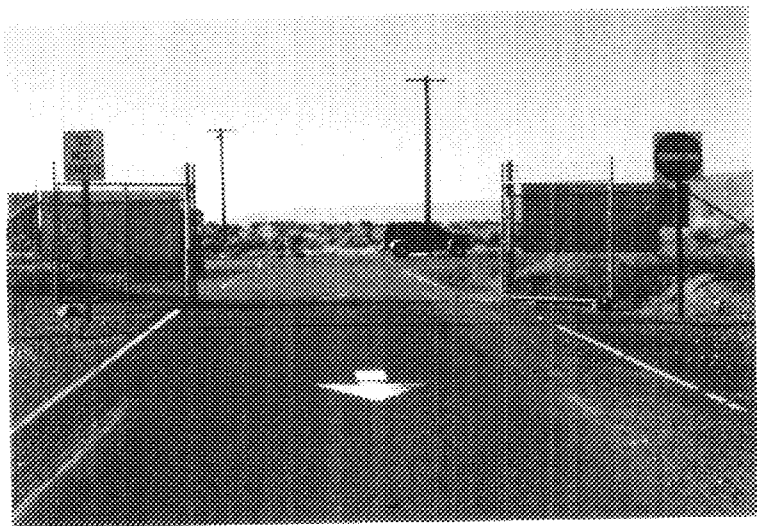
Canton Ave. looking south to Route 45. Road and opening in gate will be widened.
